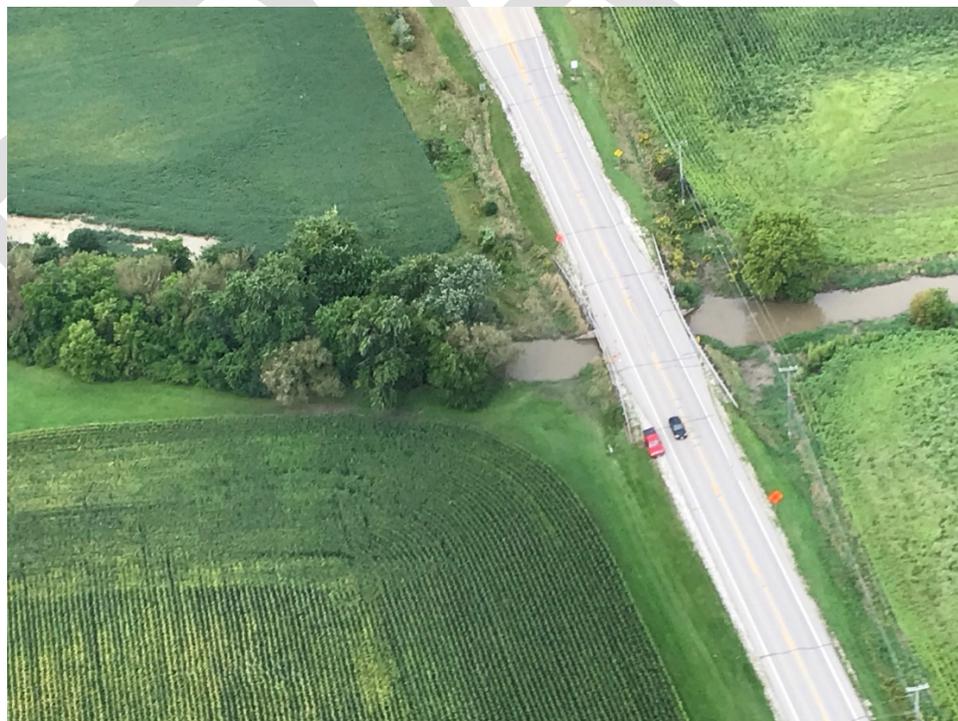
Kilbourn Road Ditch and County Highway E on September 6, 2018
